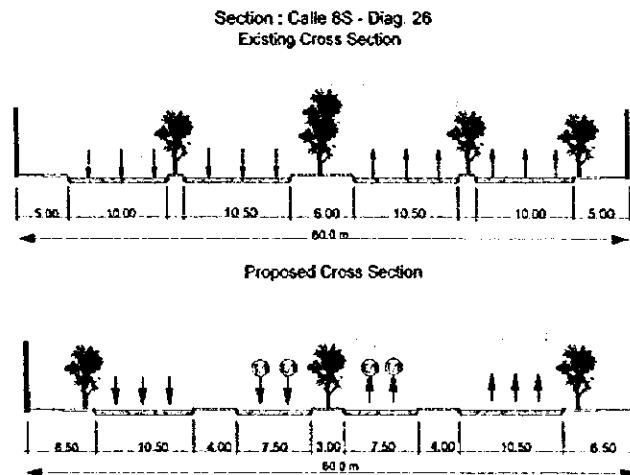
Typical Cross Section on Autopista Sur (1)
